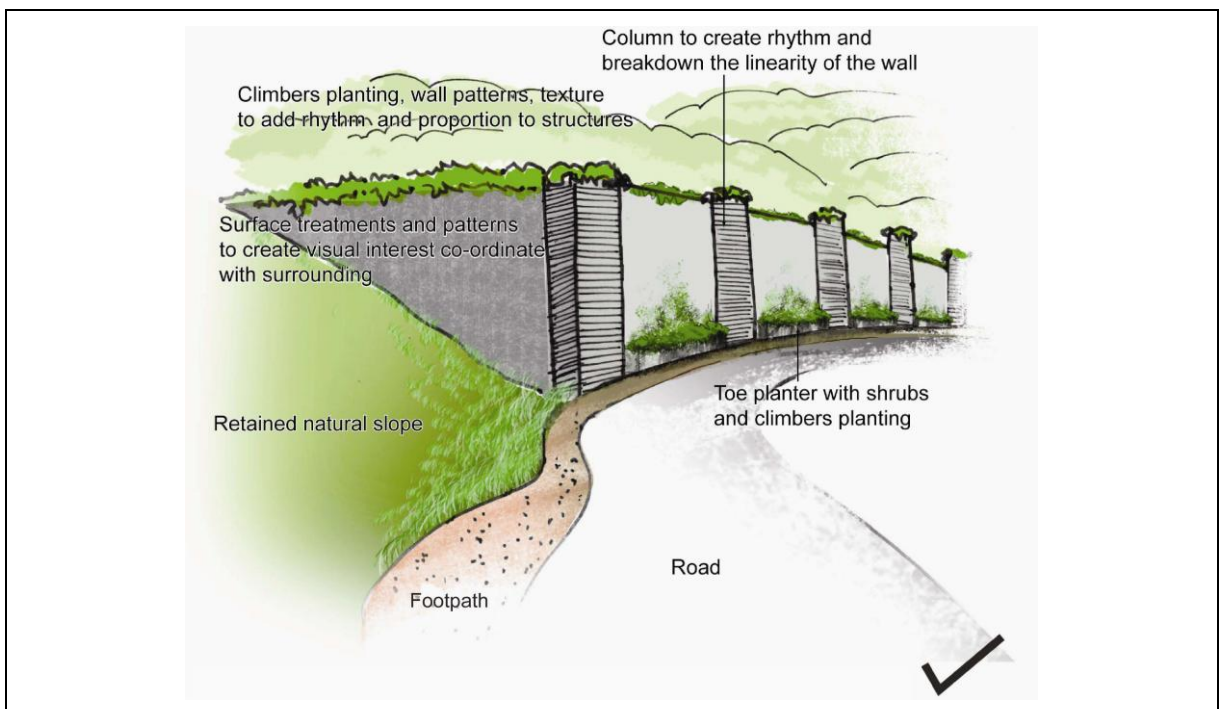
Barrier Wall with Column to Breakdown Horizontal Scale
